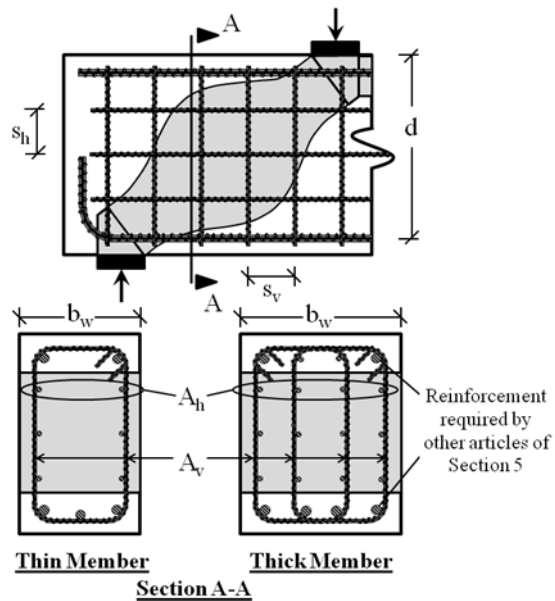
Distribution of crack control reinforcement in compression strut
